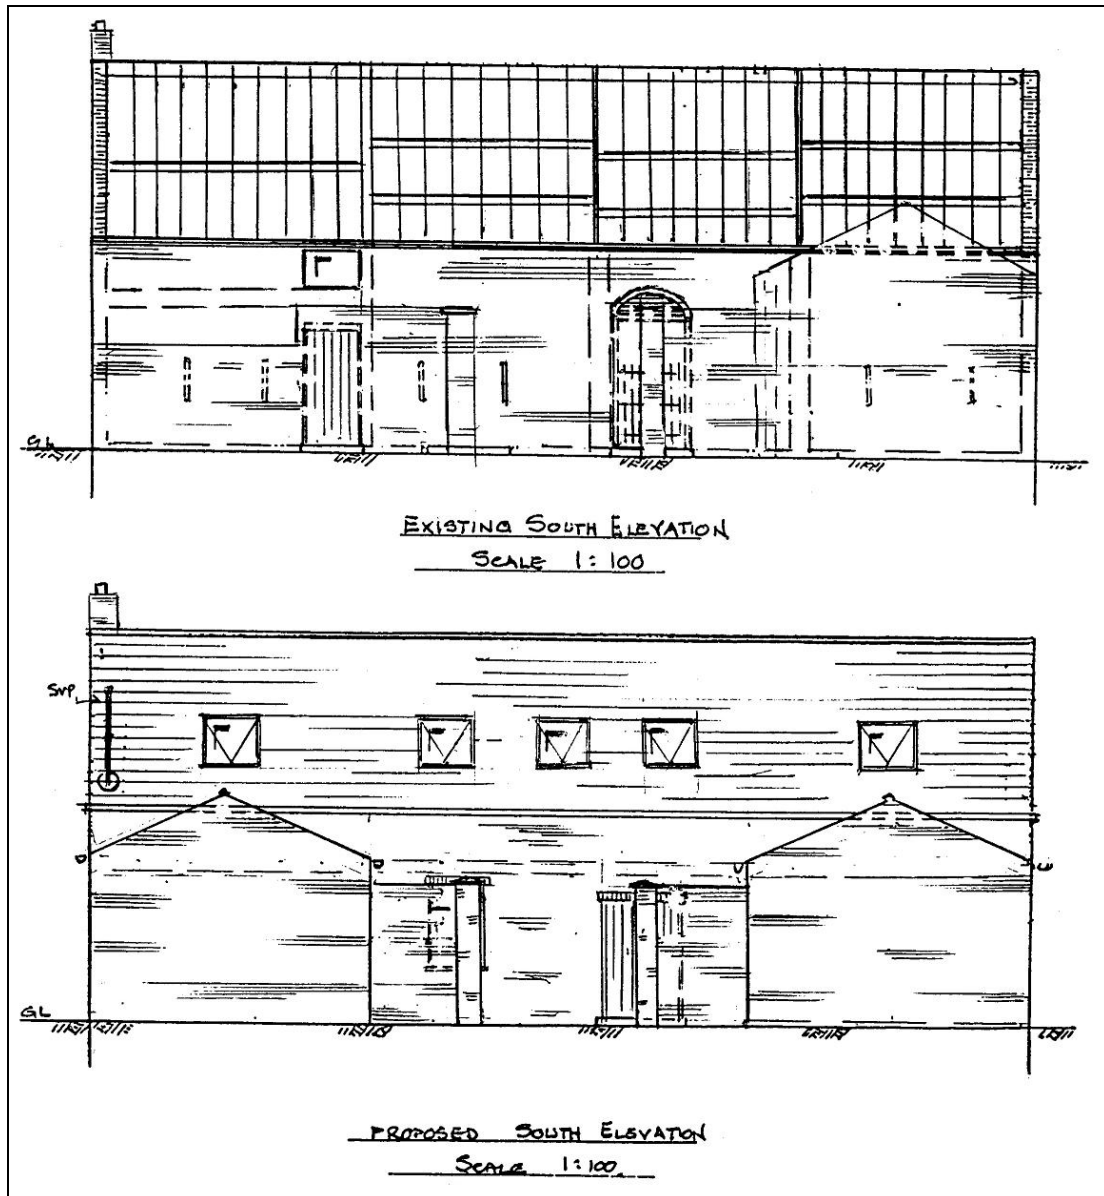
Plan of the existing & proposed south elevation (supplied by client)
